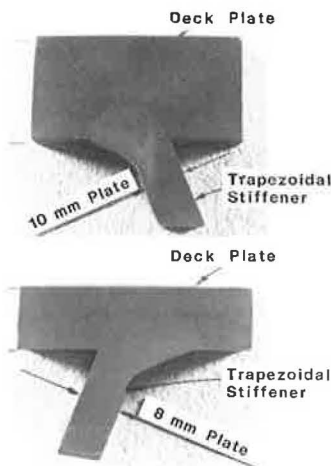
Enlarged etched cross sections of trapezoidal stiffener web to deck plate connection.
